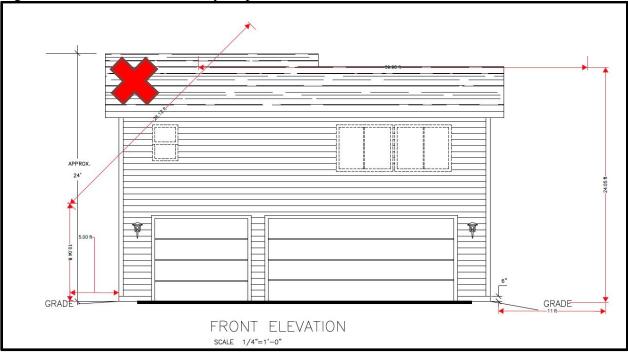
Side Yard Second Story Step Back, 2-Foot Eave Projection Allowed
